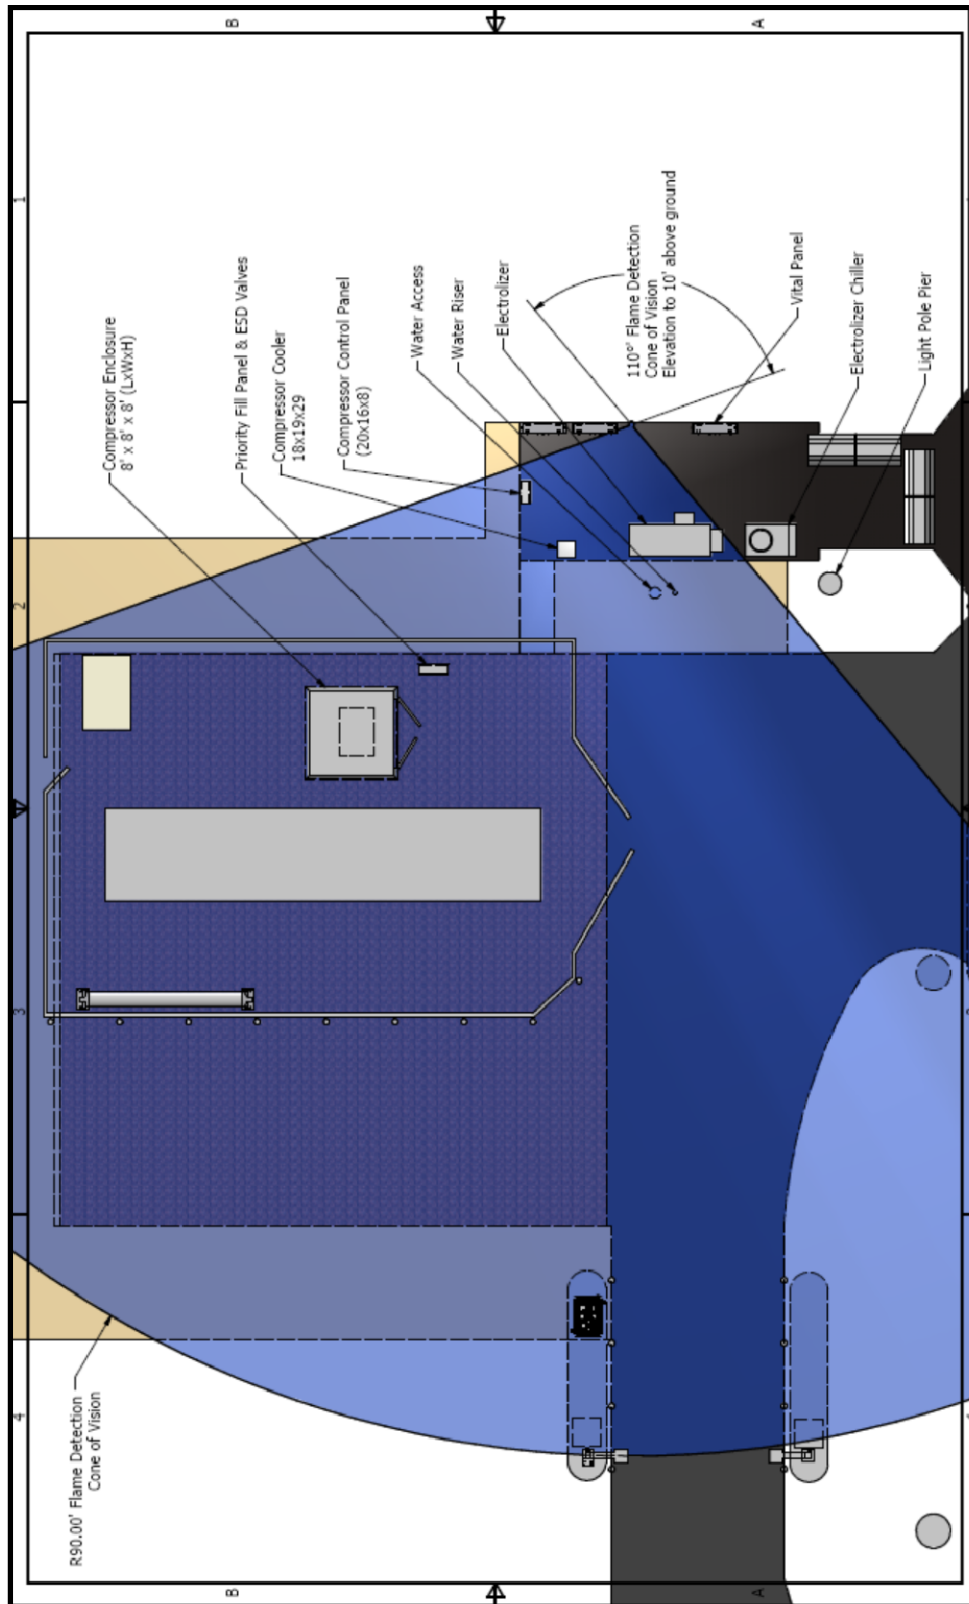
Hydrogen Fueling Station Site Plan Update
